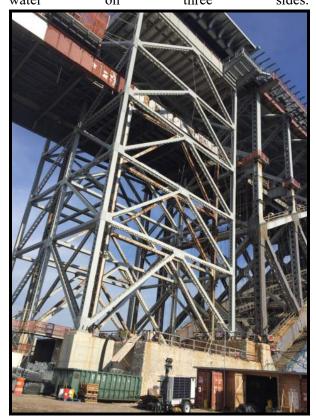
Existing Abutment Tower Surrounded by New Abutment Tower
